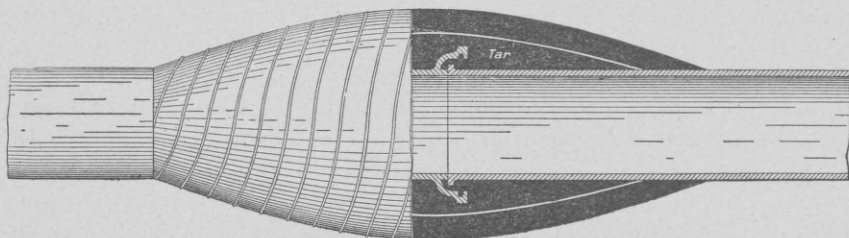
Flexible pipe joint used on the Mamie ditch.
